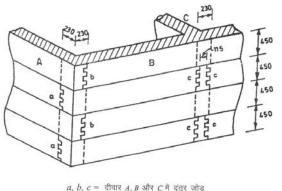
Alternating Toothed Joints in Walls at Corner and T-Junction
